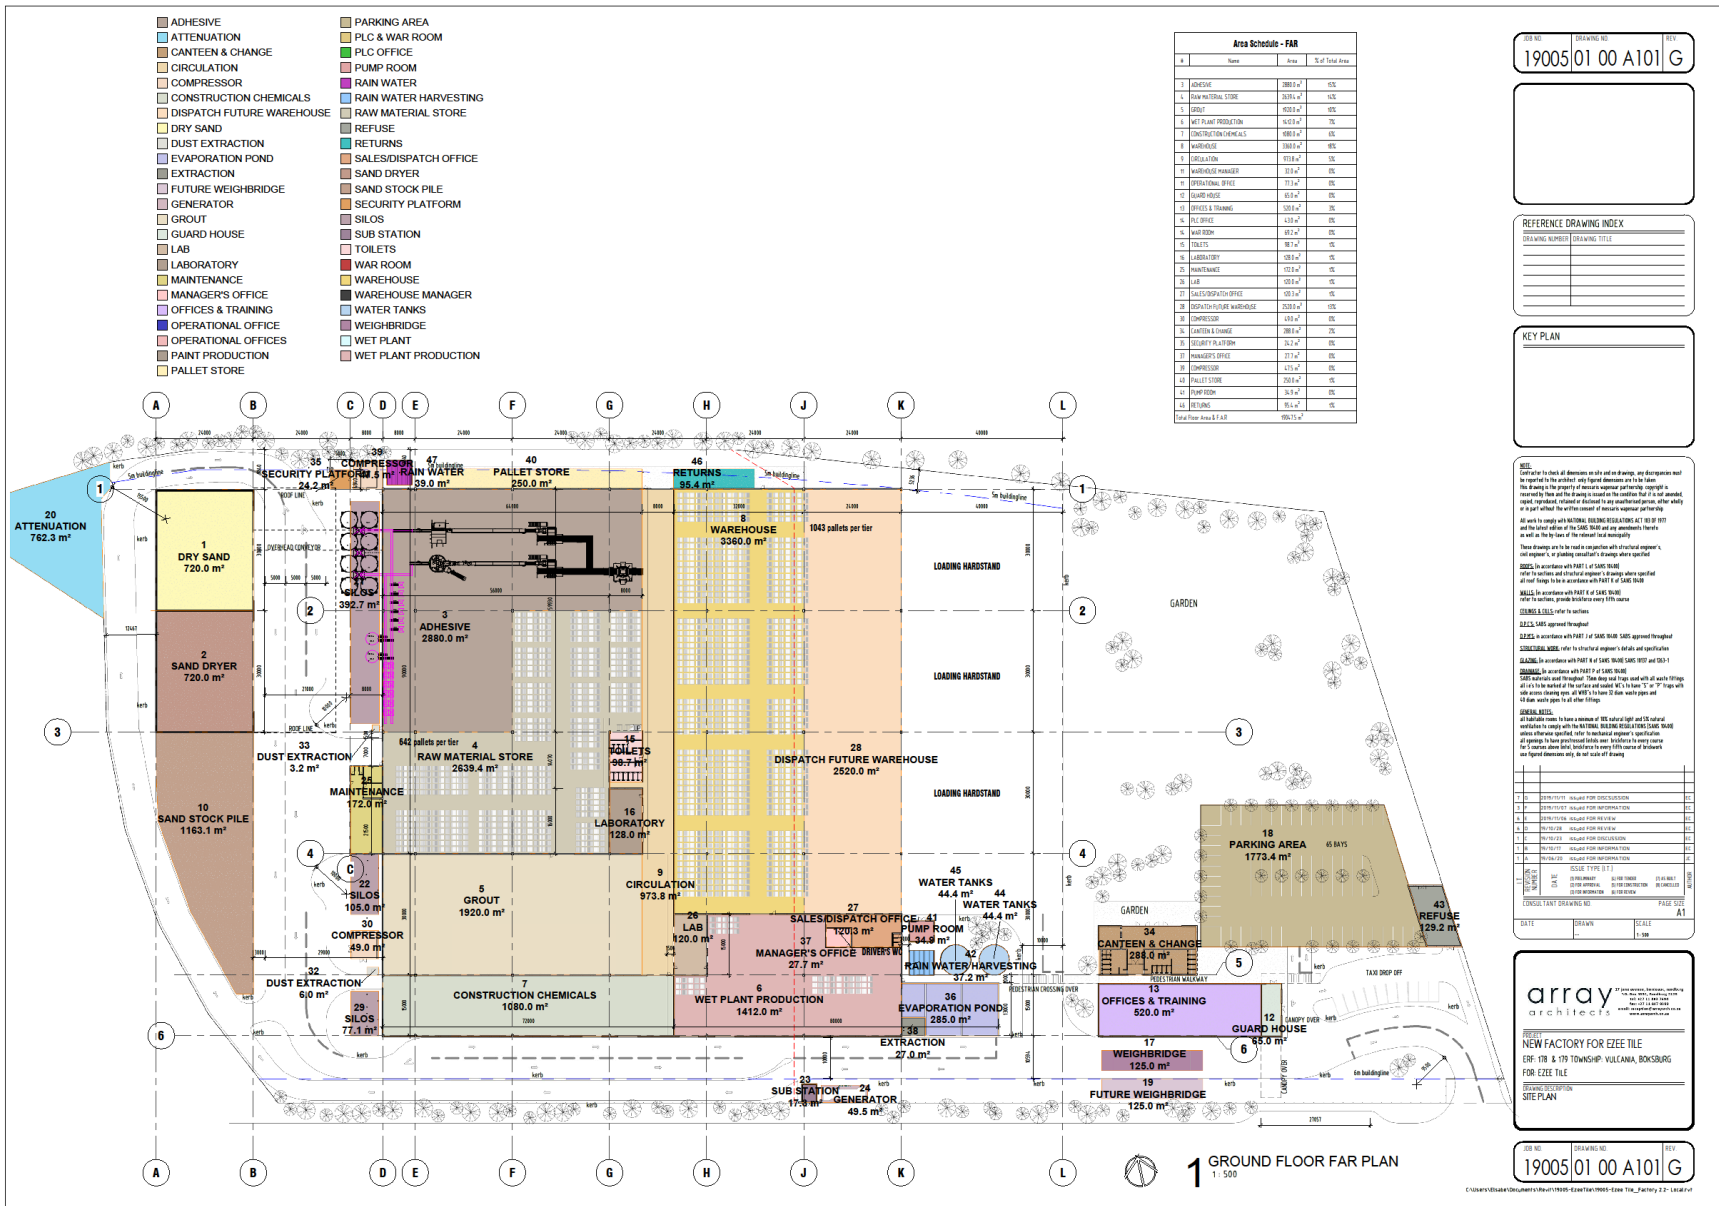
Site plan for the proposed Ezee Tile Adhesive Facility.
